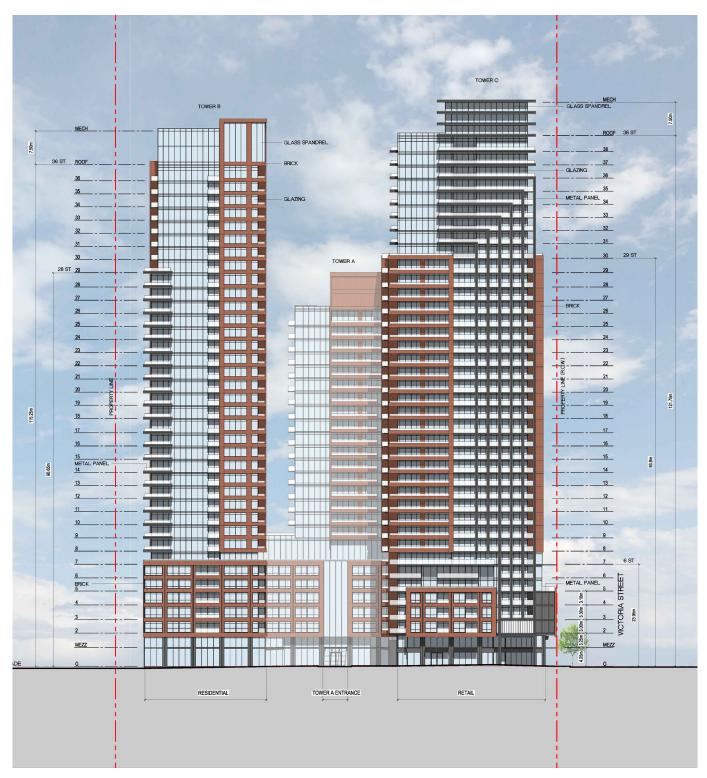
IMAGE: Proposed western building elevations facing Park Street (Source: IBI Group).
